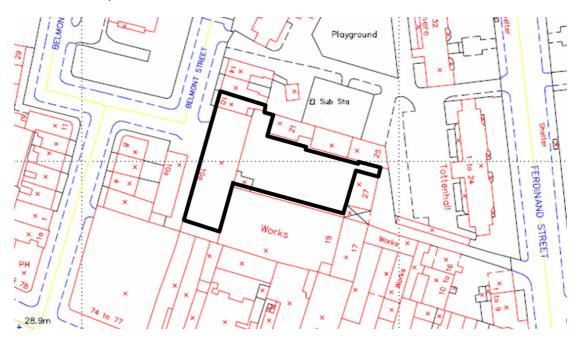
Existing Site Layout and Application Black Line Boundary (Not to Scale) Source: John Pardey Architects
